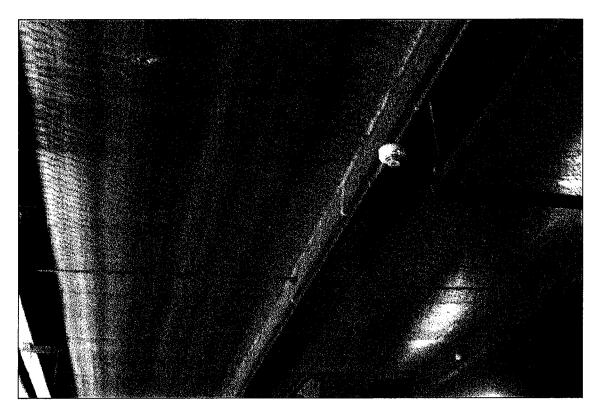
Fire Door - Plant Room Roof Space (Asbestos Free Core) SMF to Core
